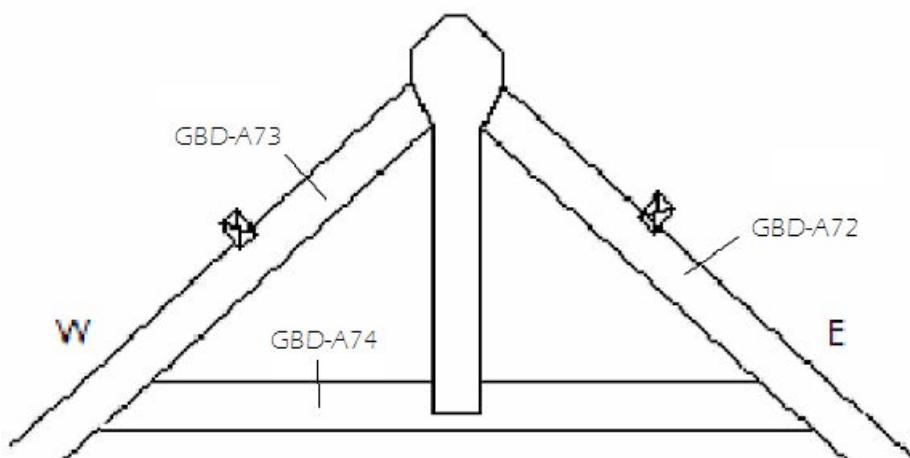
West range; sketch of truss 6, showing the location of samples GBD-A72–4
